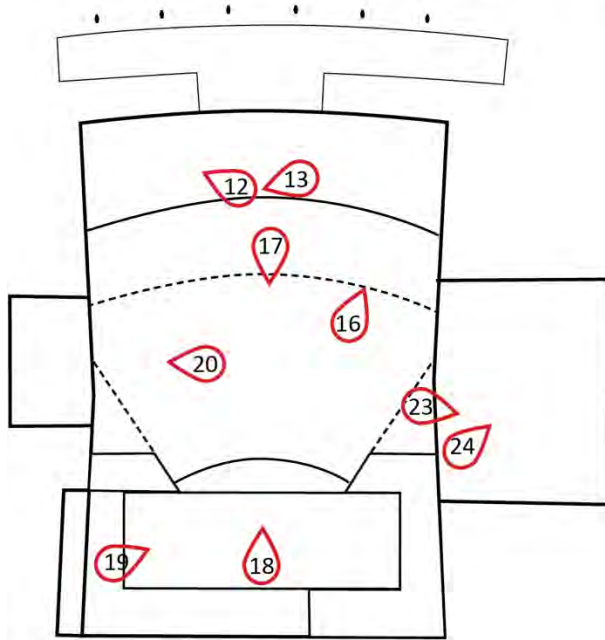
FIGURE H: PHOTO KEY: FULL SITE AND BASEMENT
